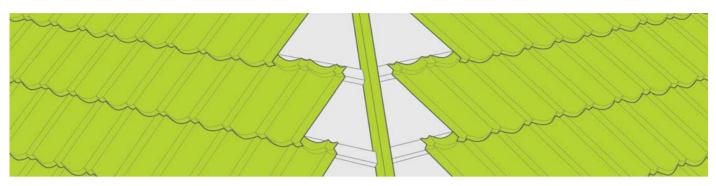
INSTALLING TILES IN THE INCLINED RIDGE AREA
